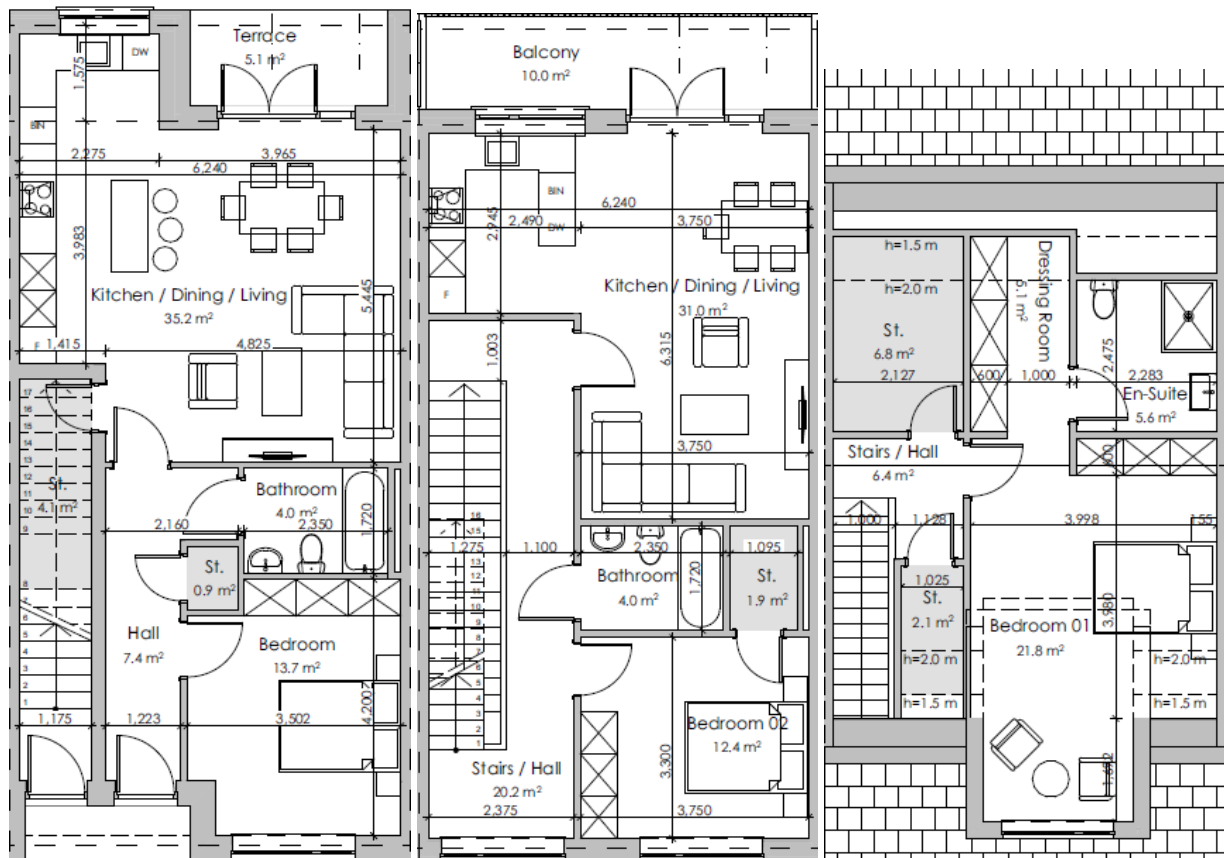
Ground (l), first (centre) and second (r) floor plans for a mid-terrace duplex apartment building.
